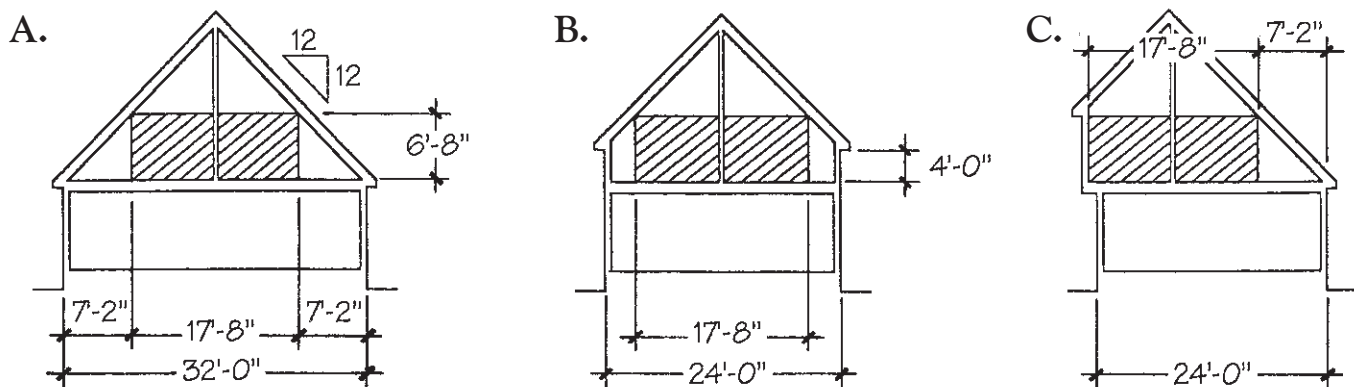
The modern Cape with 12/12 pitch roof (A) must be 32 feet wide to squeeze in two upstairs bedrooms with a “livable” headroom height of 6 feet 8 inches. Raising the eaves 4 feet (B) offers the same livable space upstairs, but allows the downstairs to be 8 feet narrower. Shifting the livable space off-center and raising one exterior wall to full height creates a classic Garrison Colonial Saltbox (C).
